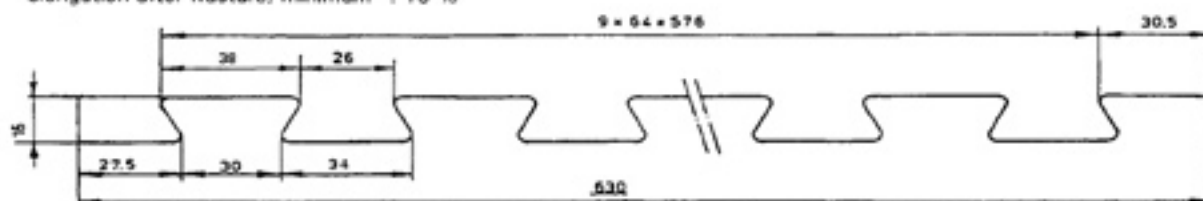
Dimensions Dovetailed sheeting (dimensions in mm)
